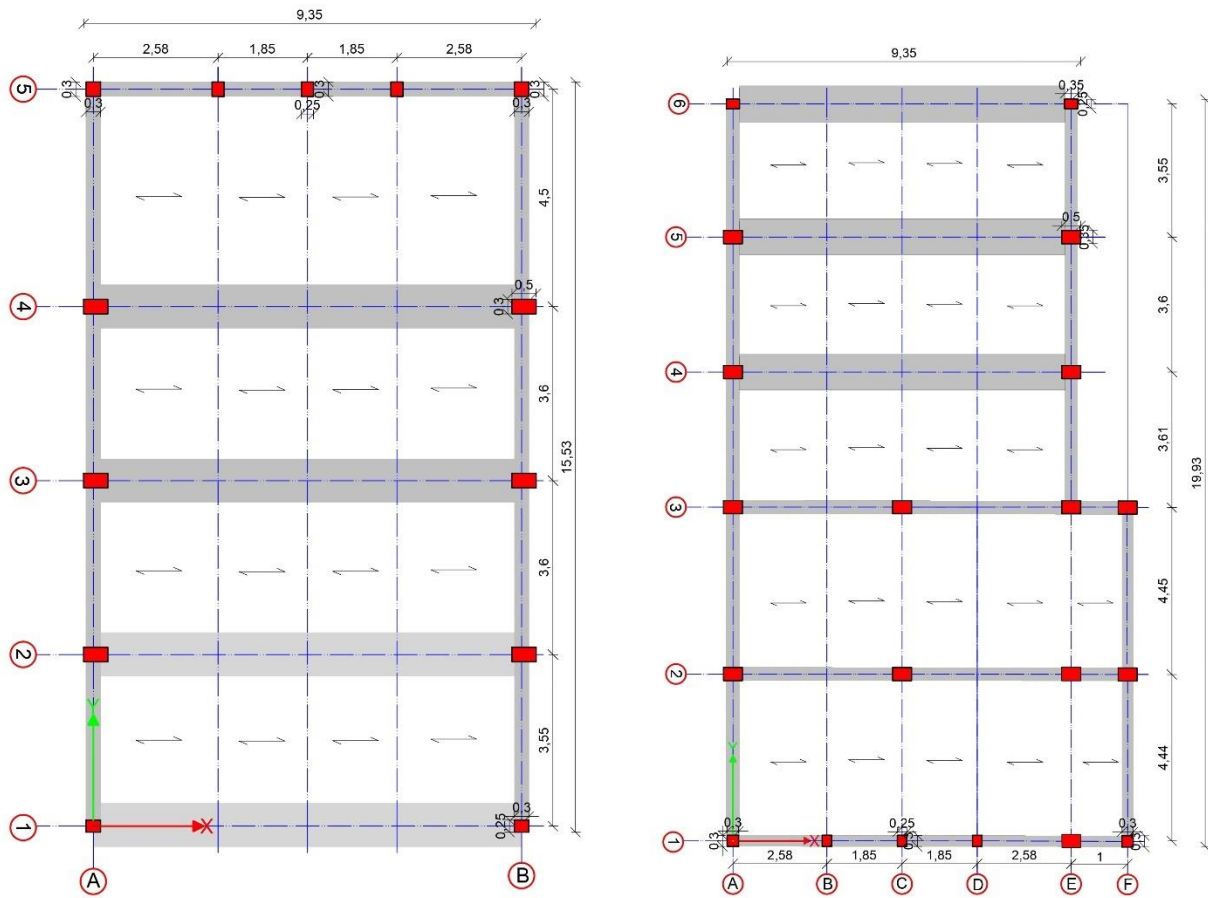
Plan View of Column Layout and Dimensions for Blocks I and II.
